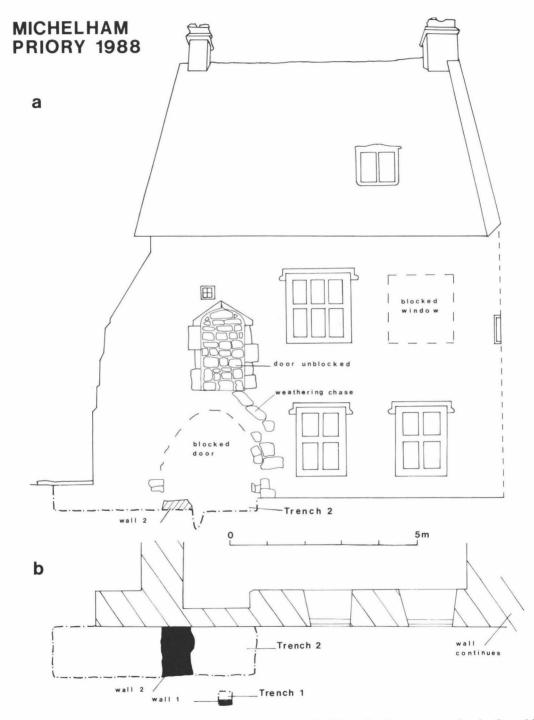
Michelham Priory 1988. a) elevation and b) plan of the west wall of the medieval western range showing the position of builder's trenches 1 and 2.
